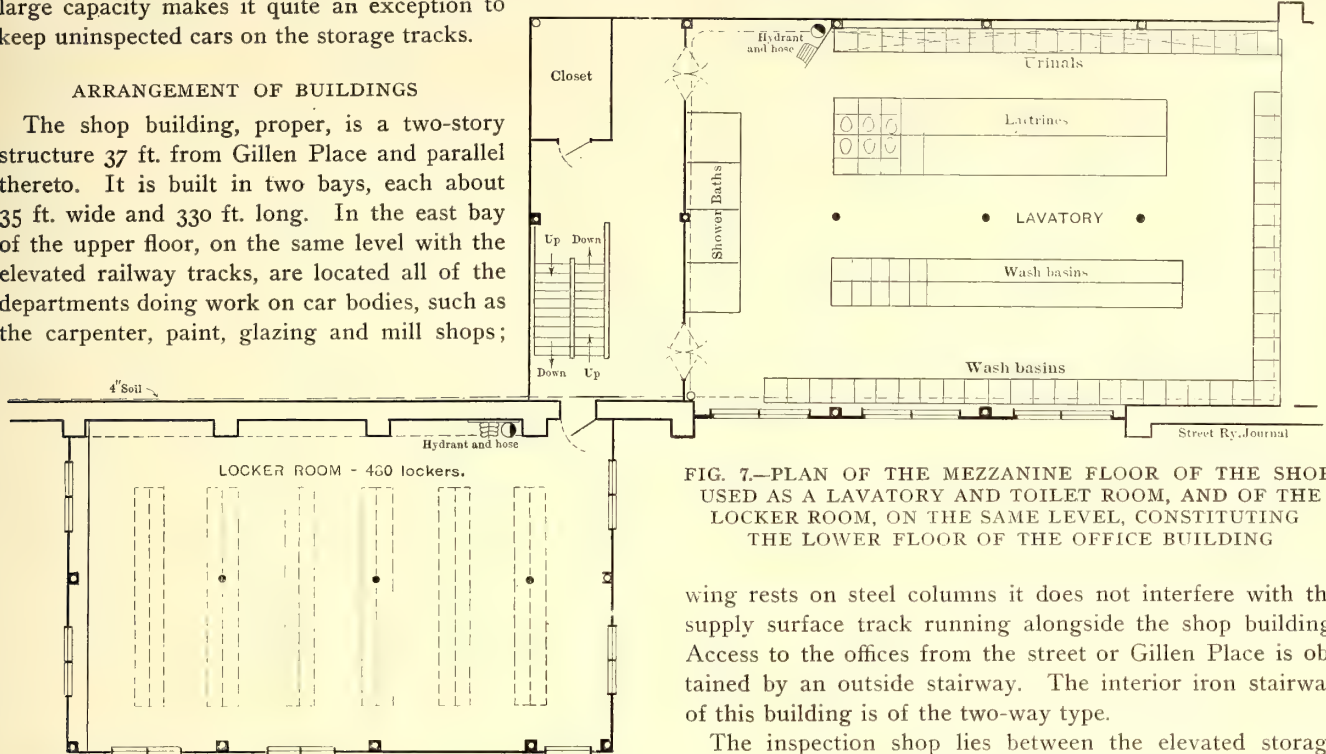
PLAN OF THE MEZZANINE FLOOR OF THE SHOP, USED AS A LAVATORY AND TOILET ROOM, AND OF THE LOCKER ROOM, ON THE SAME LEVEL, CONSTITUTING THE LOWER FLOOR OF THE OFFICE BUILDING
